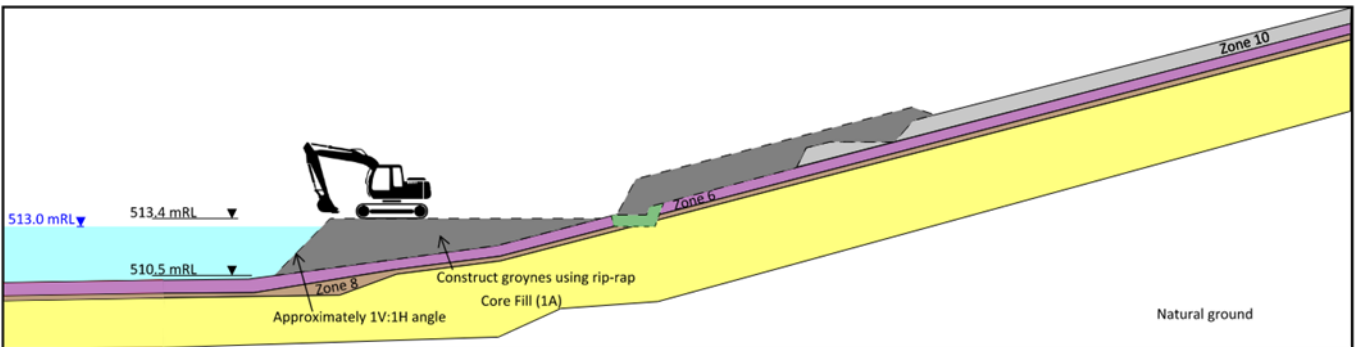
Schematic sketch – Tranche 2 – abutments – construction of groynes
